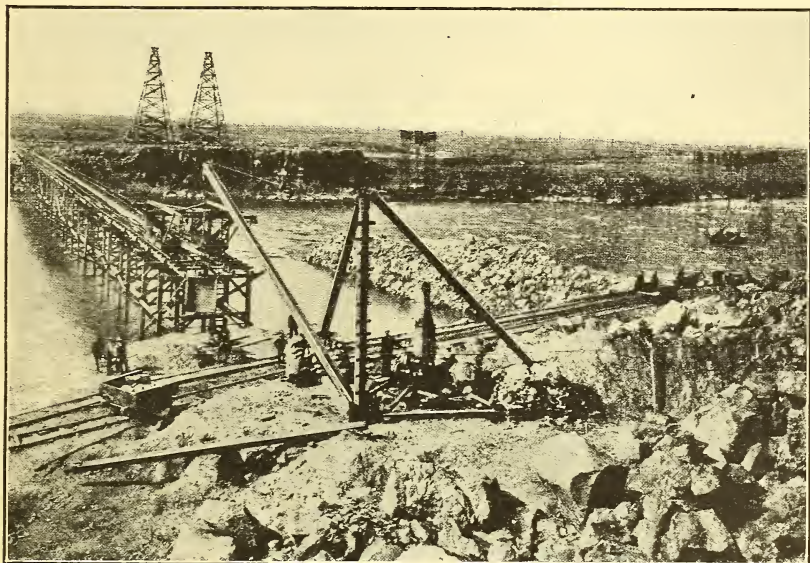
Showing derrick handling skips, and cableways in action; also showing double trestle from which earth was dumped in the back-filling, Minidoka project, Idaho (U. S. Reclamation Service).
